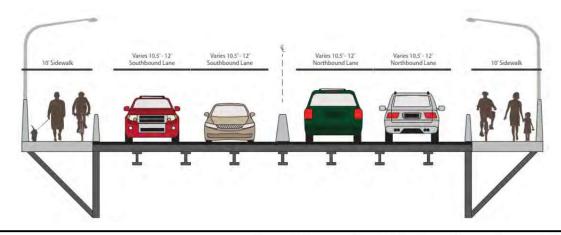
Proposed Typical Section – Warren Avenue Bridge
